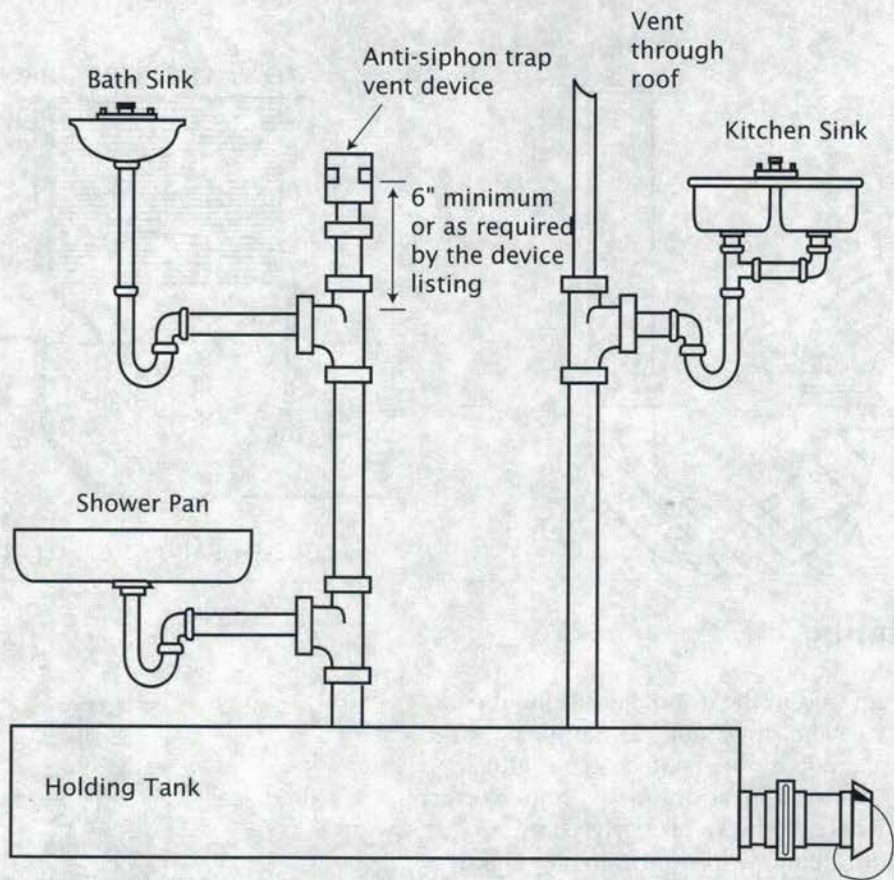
Methods of Venting (ASTVD, Roof Vent, and Connection with Vented Waste Line)
